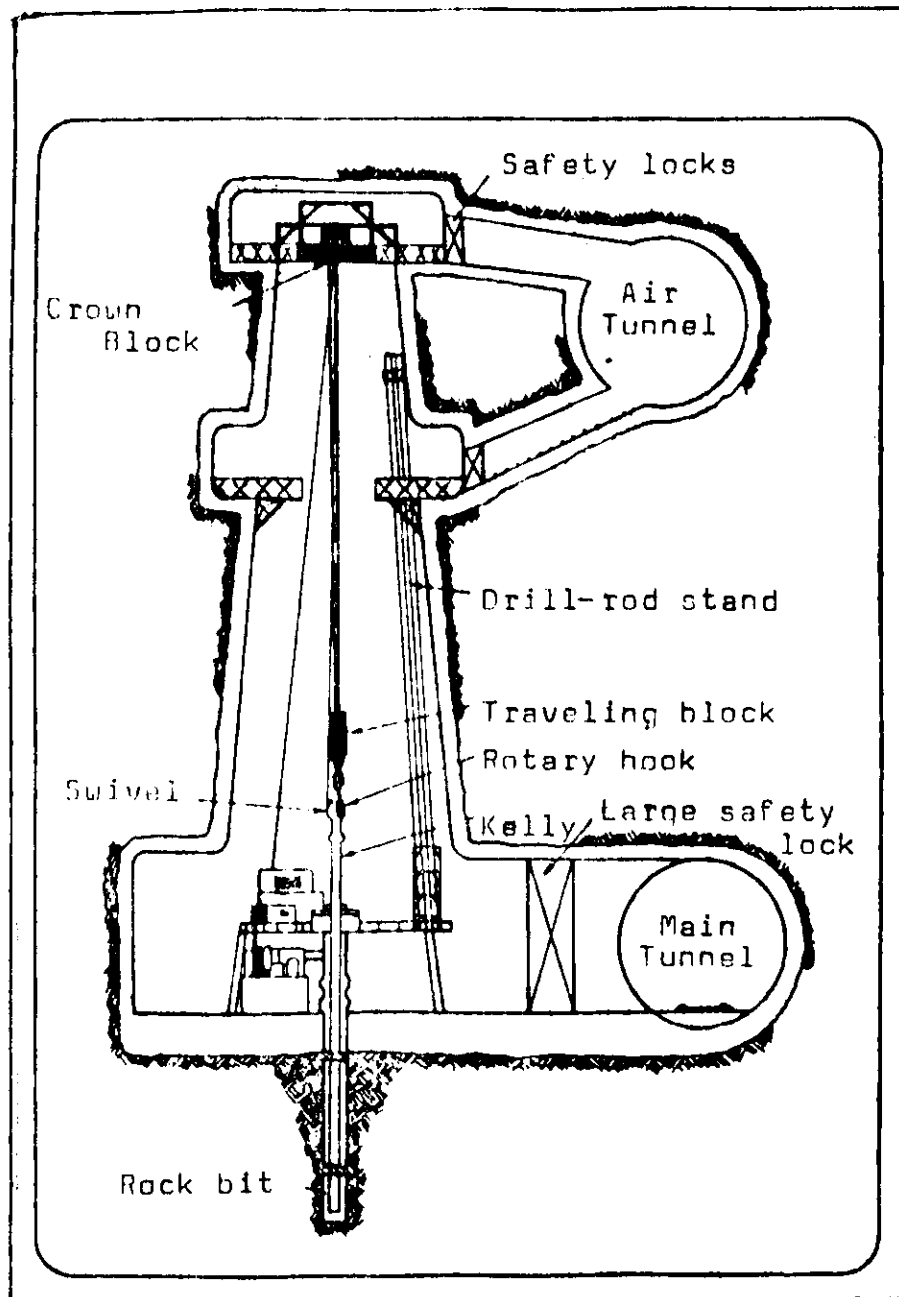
Drilling Chamber in a Tunnel Concept (Lewis et al., 1977)
